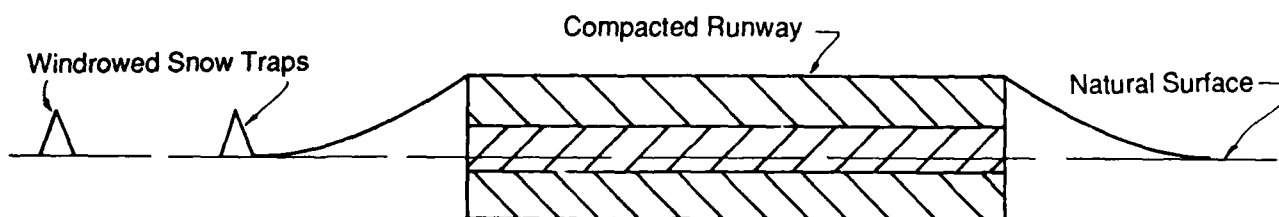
Typical cross section of a three-layer elevated snow road (NCEL).
